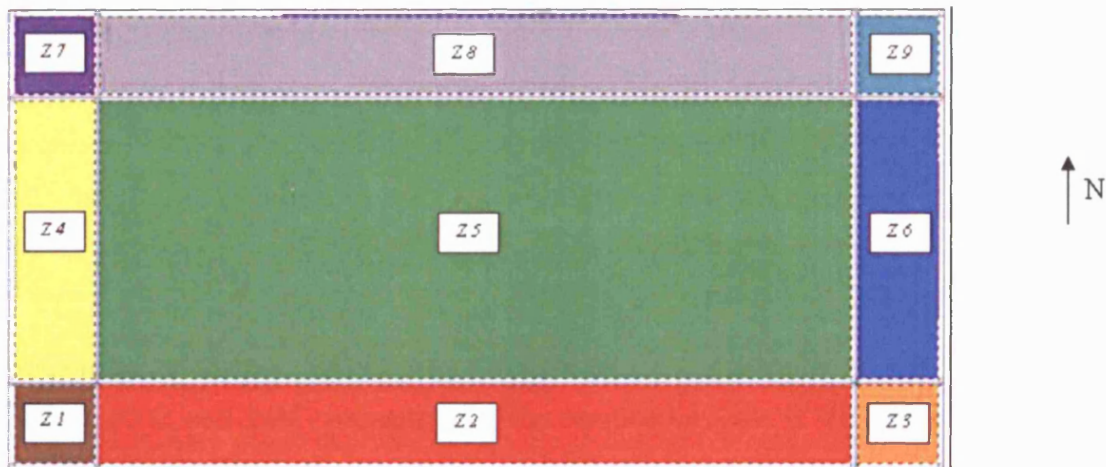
The 9 zones<sup>30</sup> of a typical floor of the case study building.
